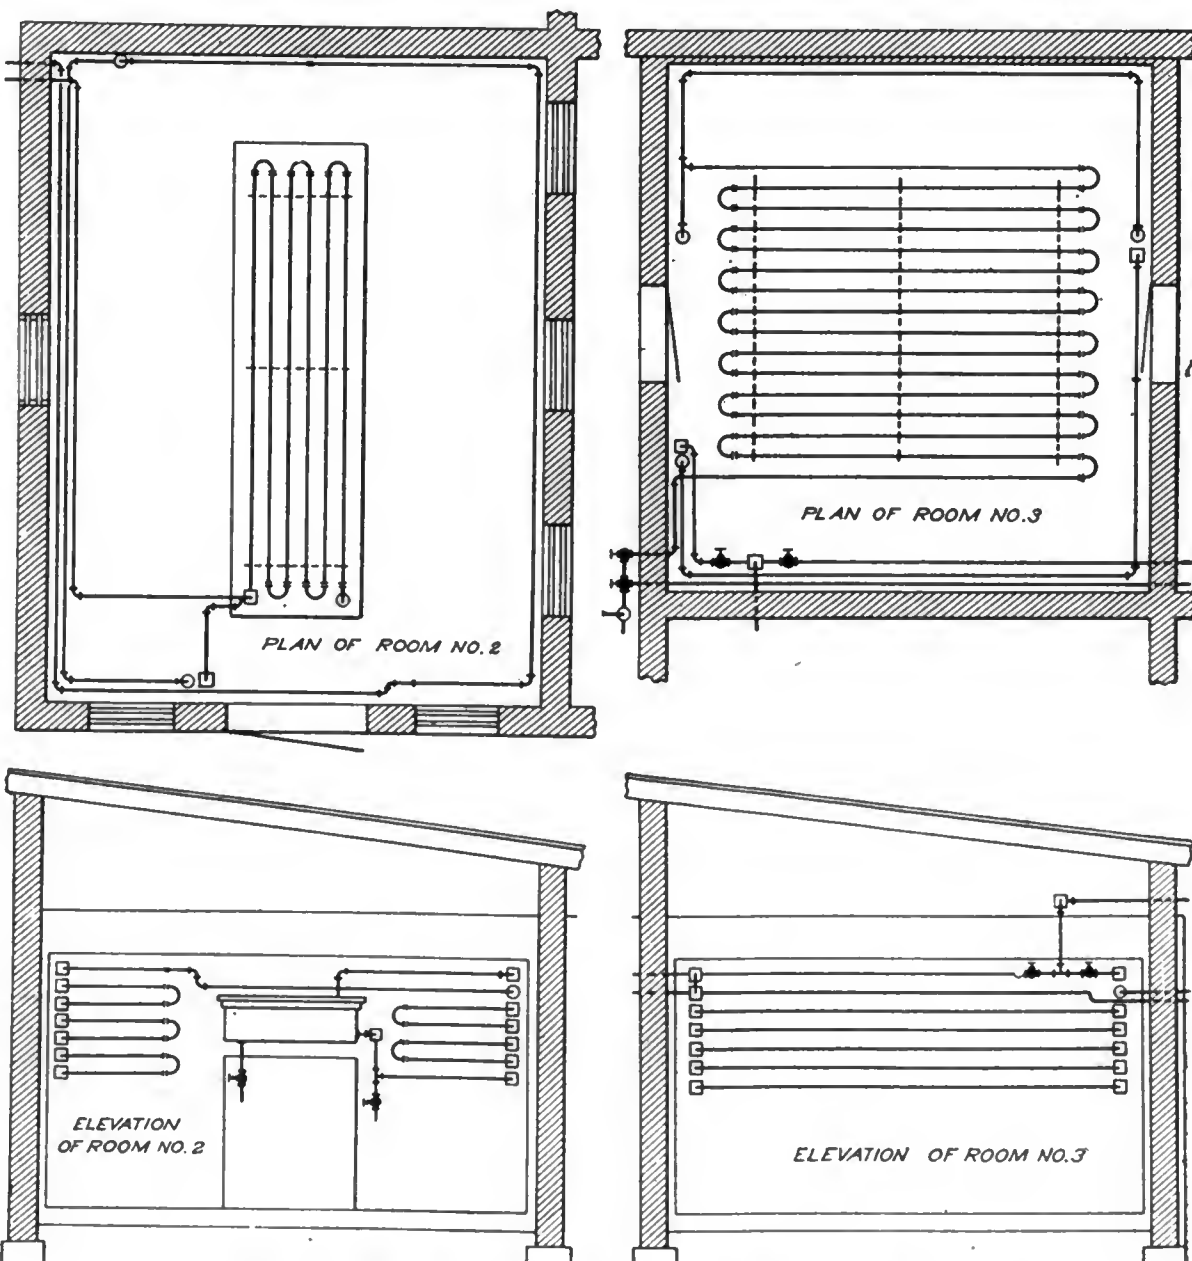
Plan and Elevation of Cold Storage Rooms.
